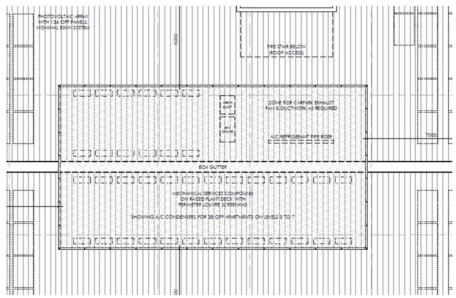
ROOFPLAN EXTRACT SHOWING AC DECK
